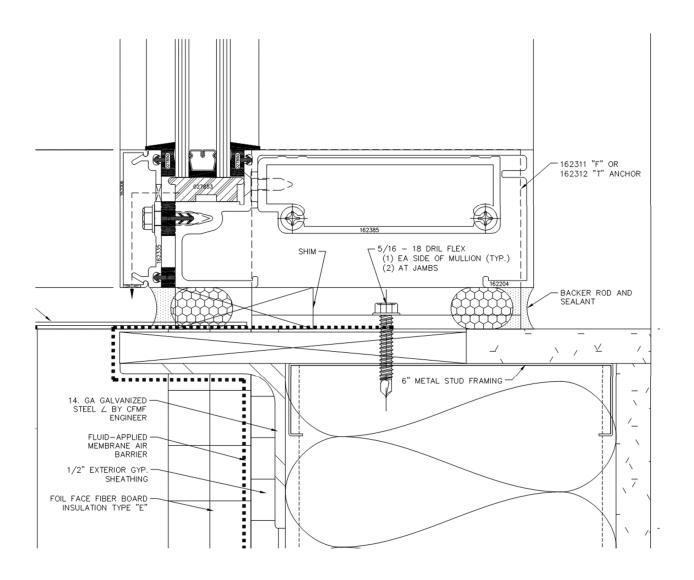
SILL ANCHOR INTO LIGHT GAGE
